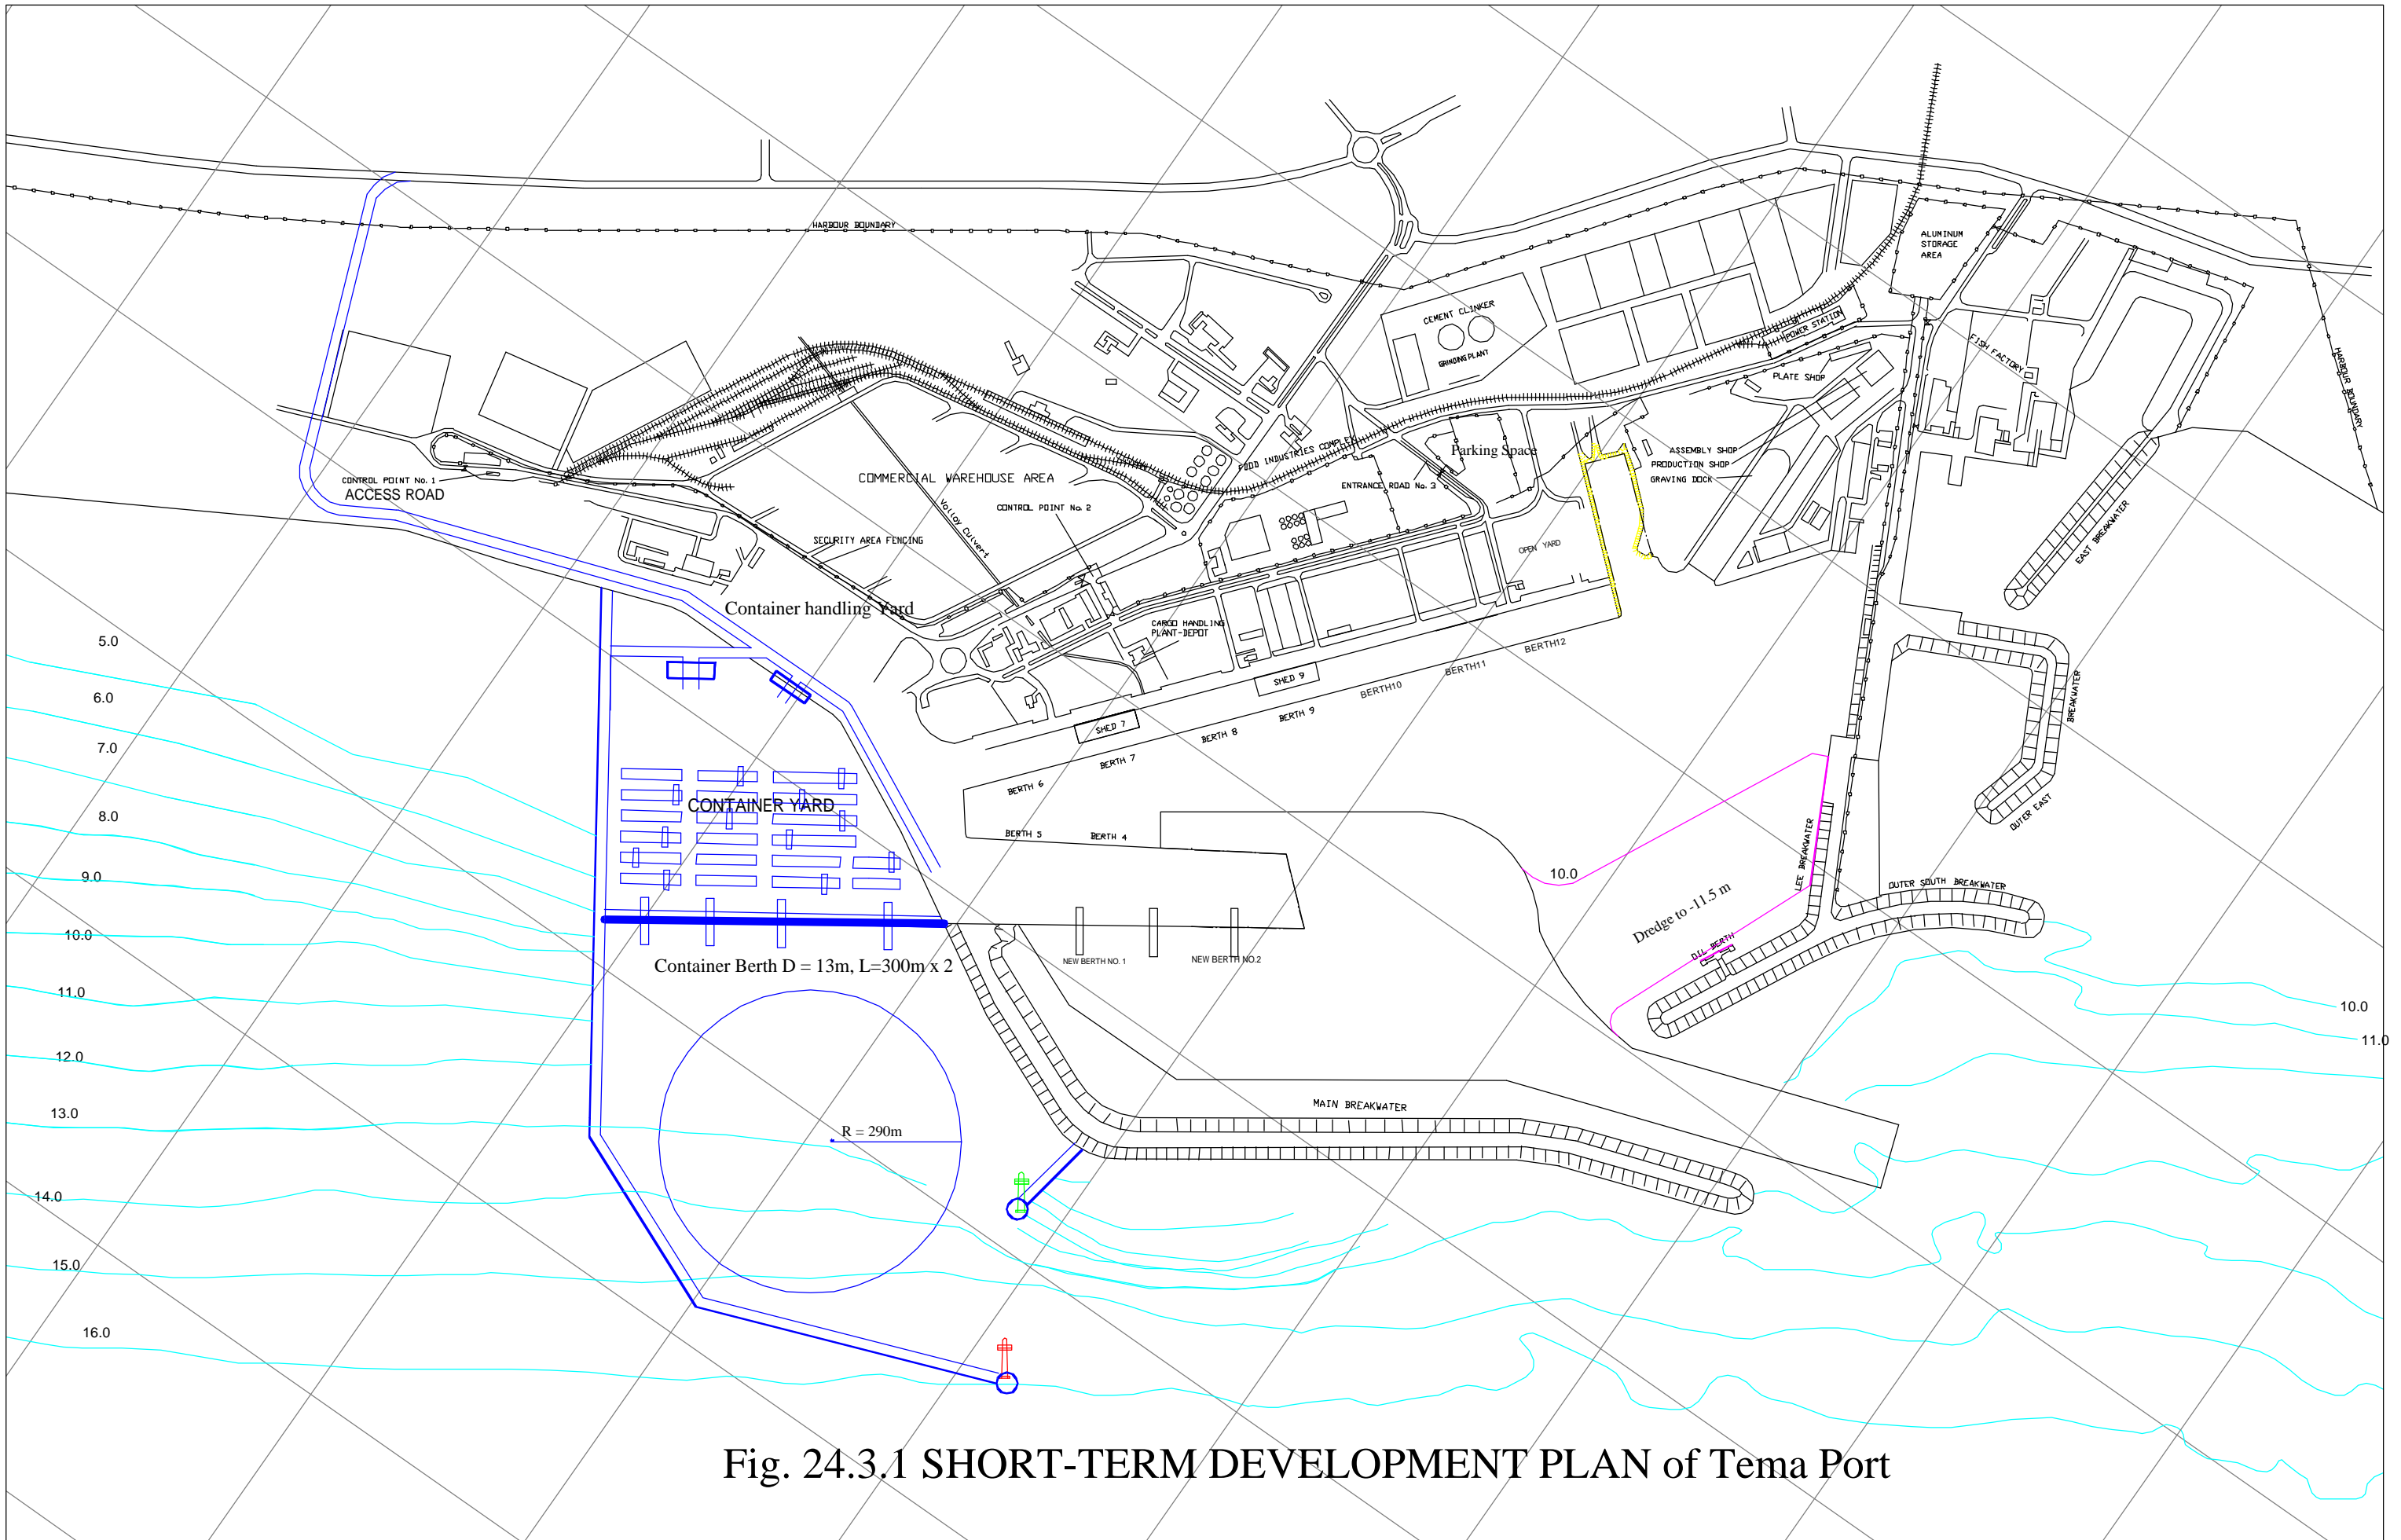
SHORT-TERM DEVELOPMENT PLAN of Tema Port
